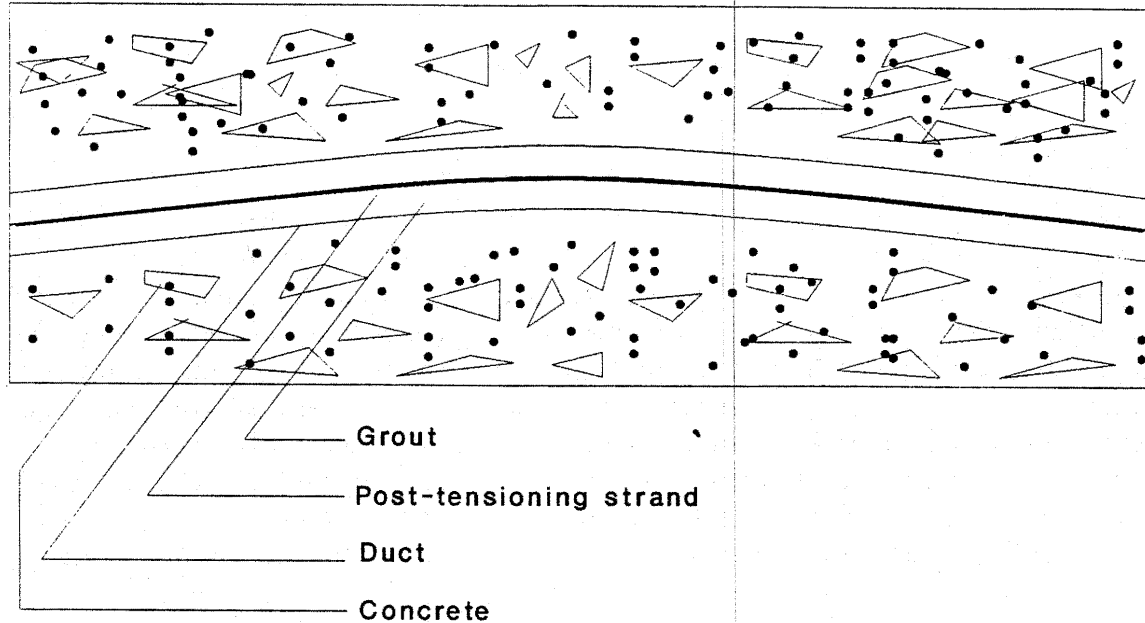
Longitudinal section of a concrete element with post-tensioning tendon.
